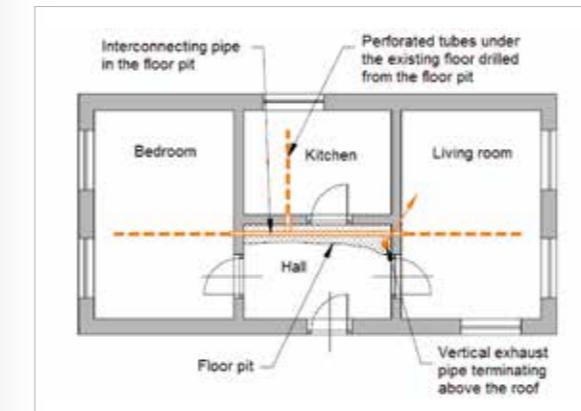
Perforated tubes installed from the floor pit excavated in one room
